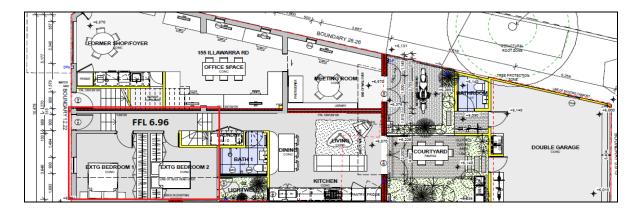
Extract from ground floor plan showing floor area to be raised to RL 6.96m AHD
